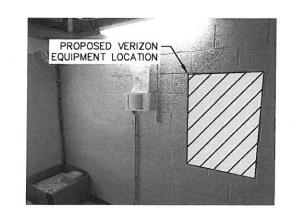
PROPOSED LOCATION OF NEW VERIZON EQUIPMENT IN THIRD FLOOR STORAGE ROOM.
